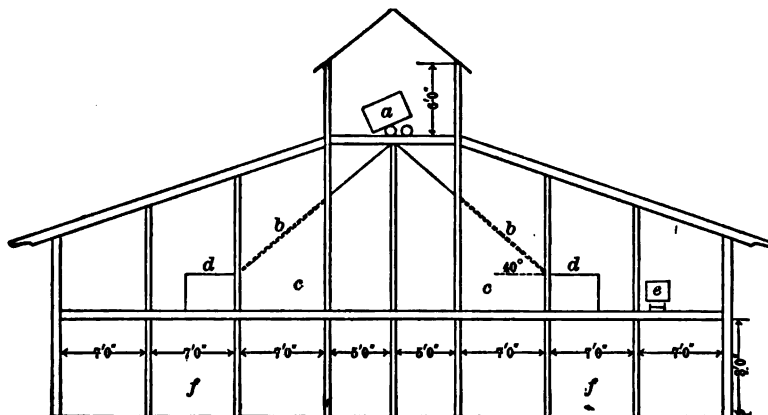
SIDE ELEVATION OF A CRIPPLE CREEK ROCK HOUSE.
